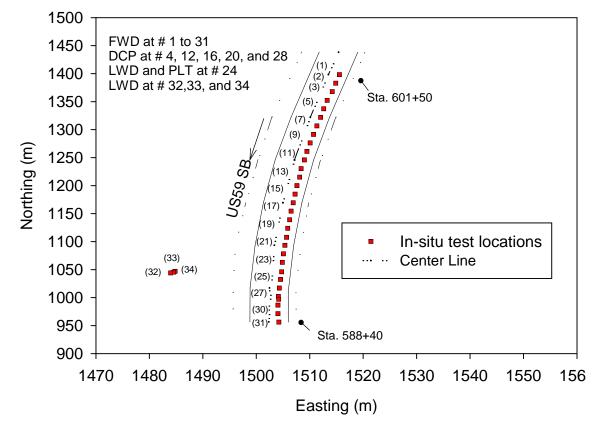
Test section plan layout with RTK GPS test points US 59 Le Flore County, Oklahoma
